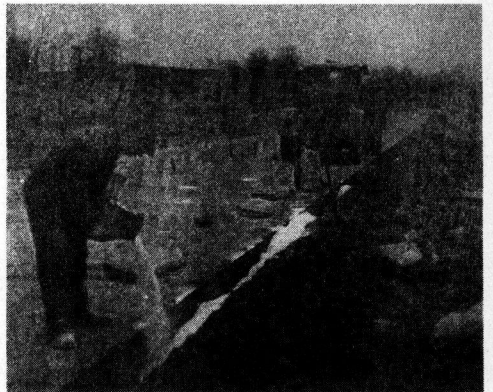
Calcium Chloride Being Poured Into a Trench Alongside a Pavement.
